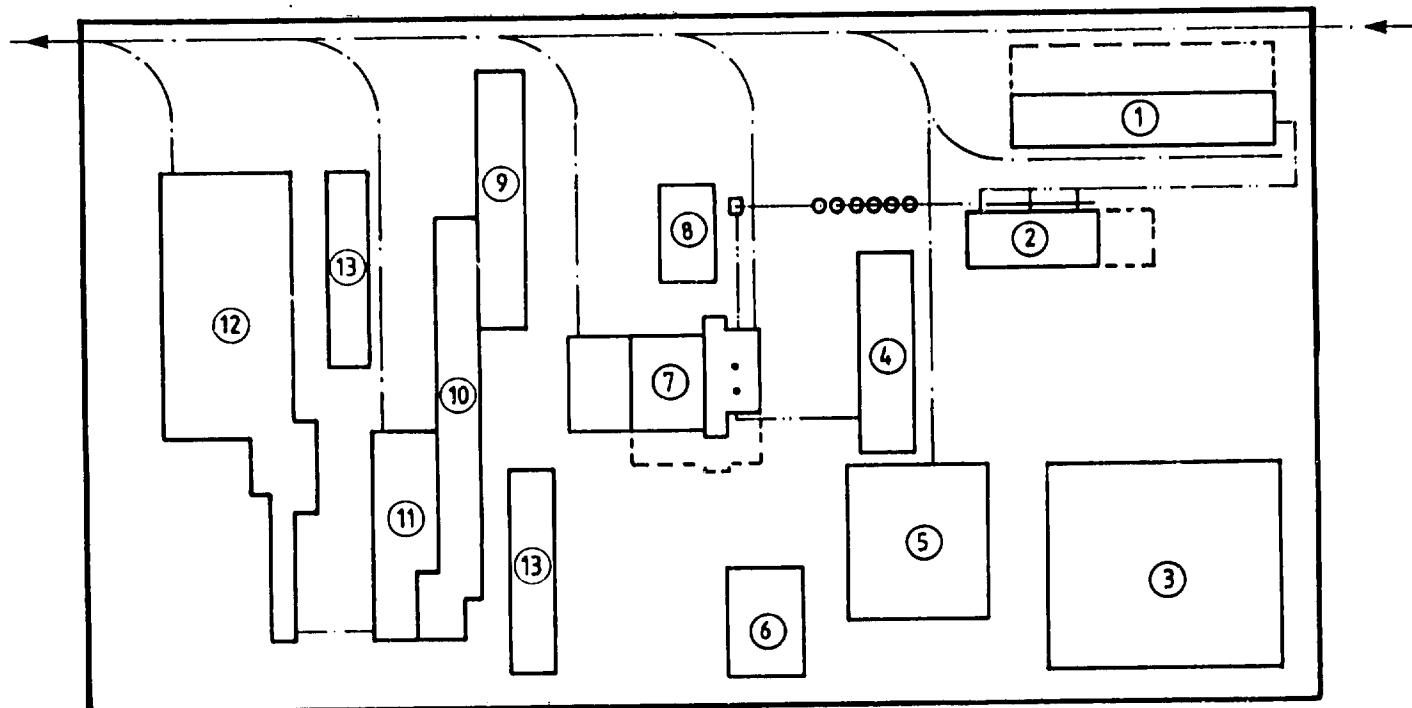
TYPICAL BF/BOF STEELWORKS LAYOUT
